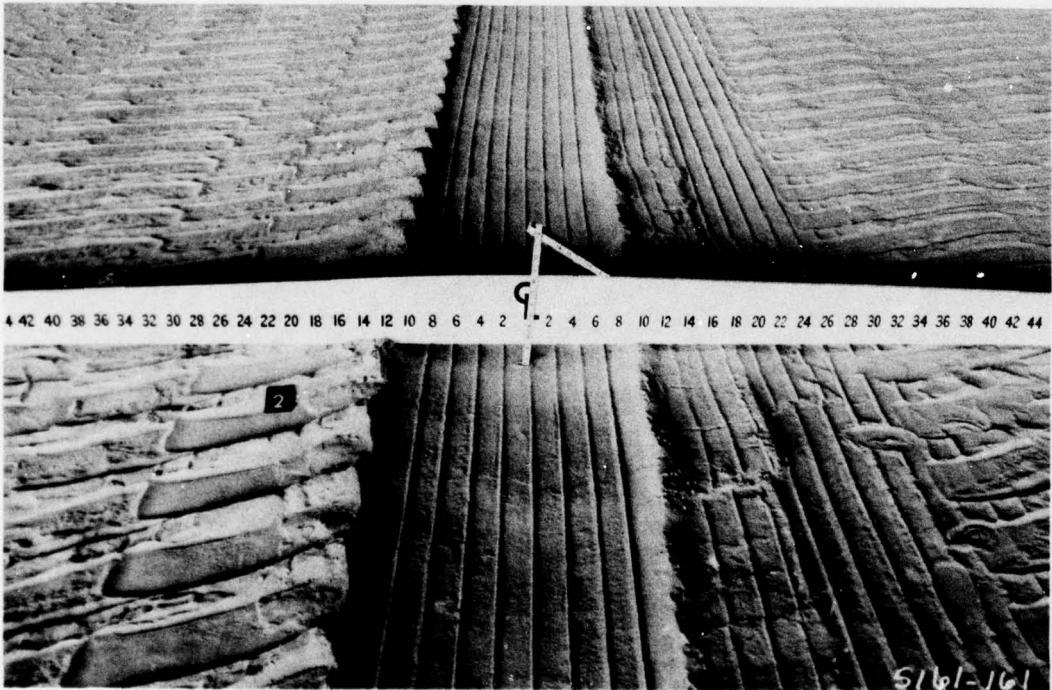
Two- and one-half-inch rut in Test Section No. 5, item 2, under C-130 traffic
